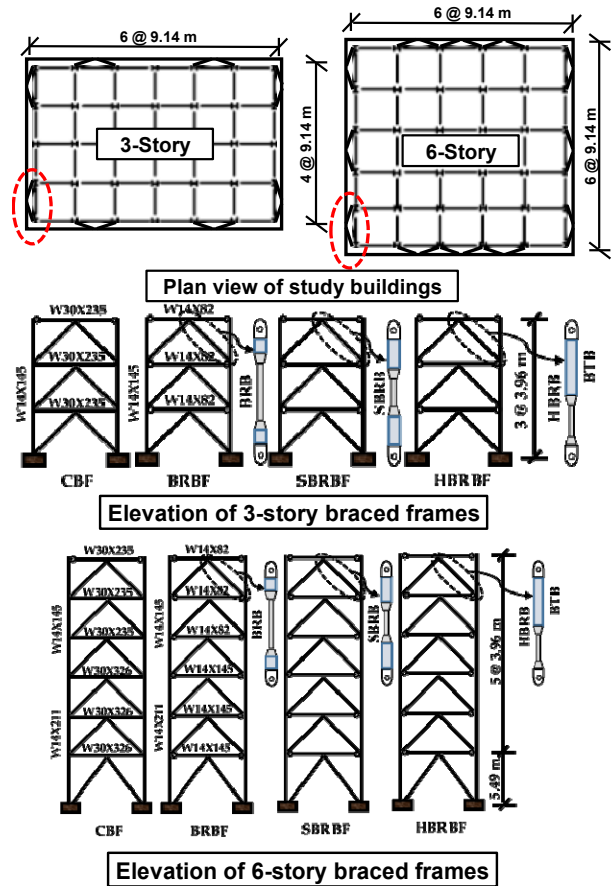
Plan layout of 3- and 6-story study buildings and elevation of braced frames
